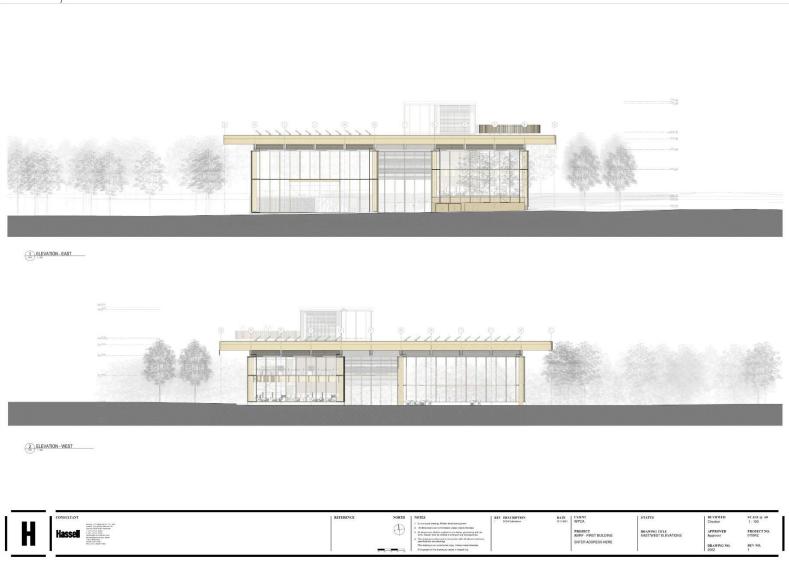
AMRF – First Building east-west elevations (Architectural drawings prepared by Hassell, 2021).
